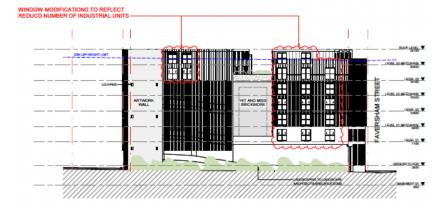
Subject site - Section - Faversham St to Wicks Place (Place Studio)
